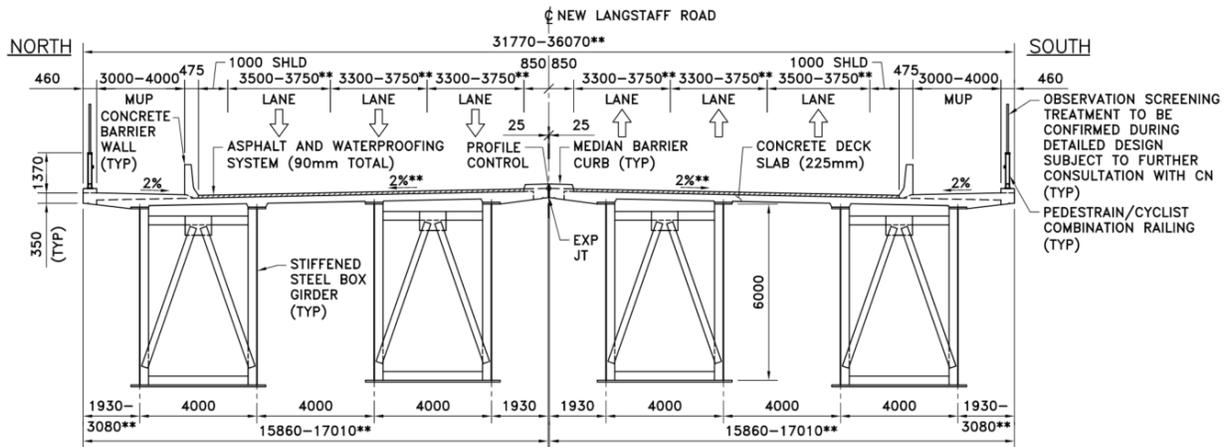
Proposed Cross Section – Main Spans – Steel Box Girder
